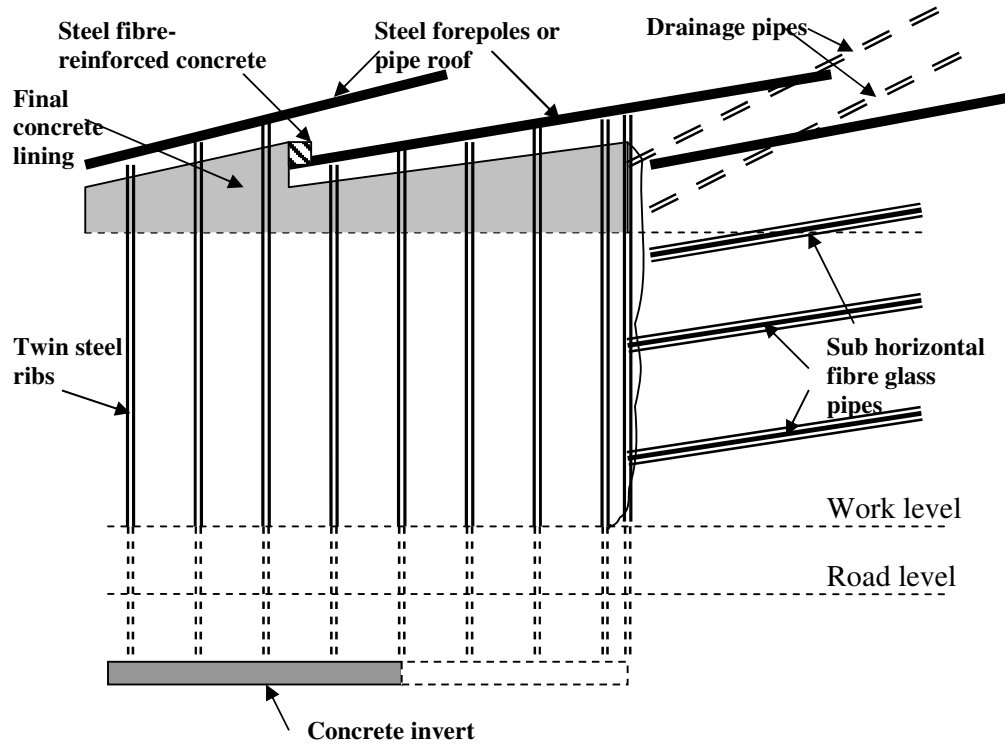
Longitudinal section of umbrella arch and other face reinforcement.
